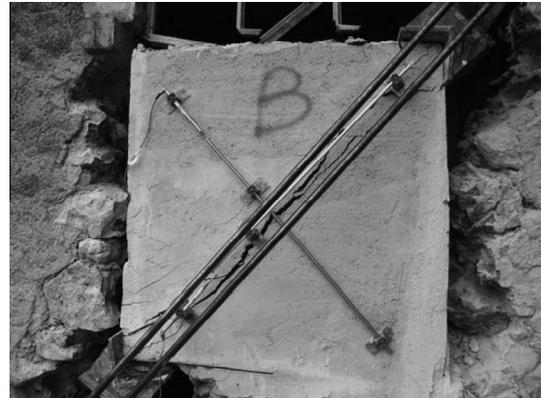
Crack pattern of a reinforced panel tested at Colle Umberto.
